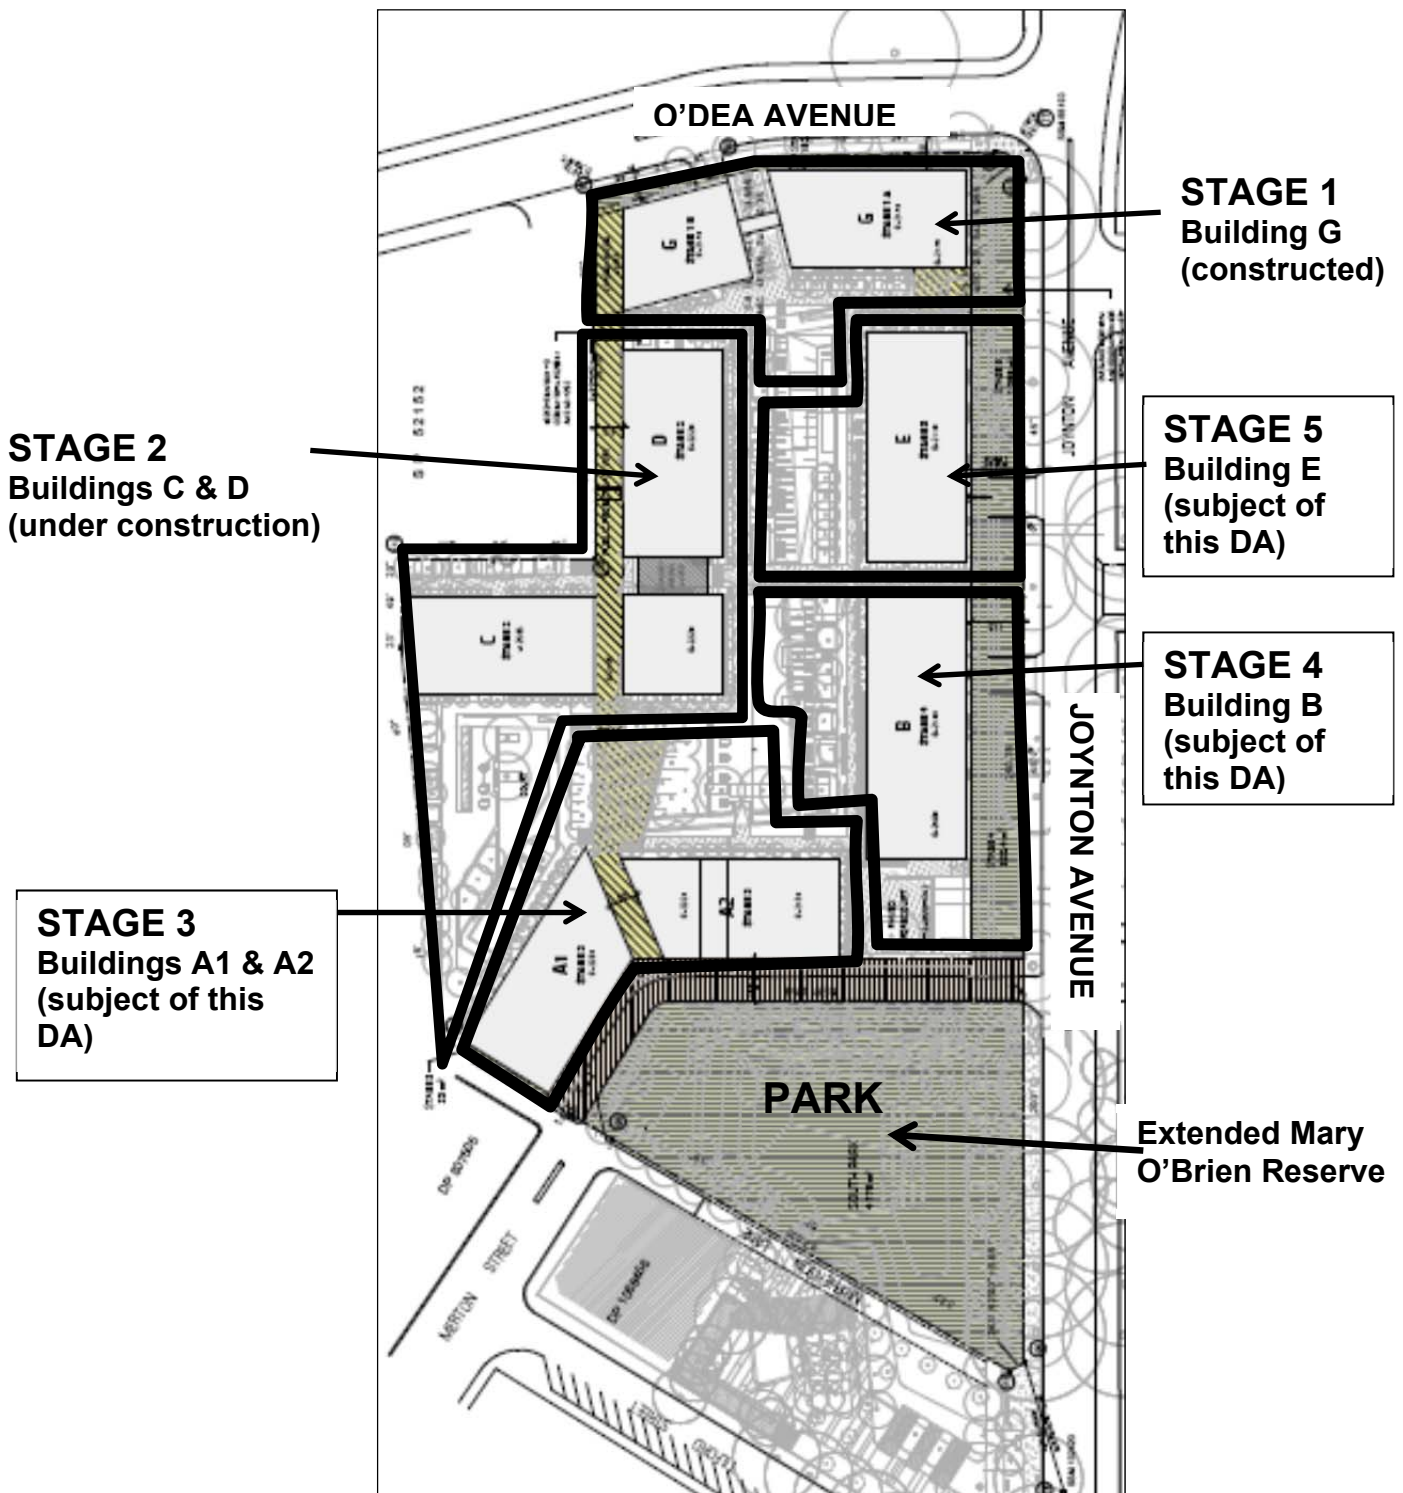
The approved locations of the 7 buildings pursuant to D/2004/225
